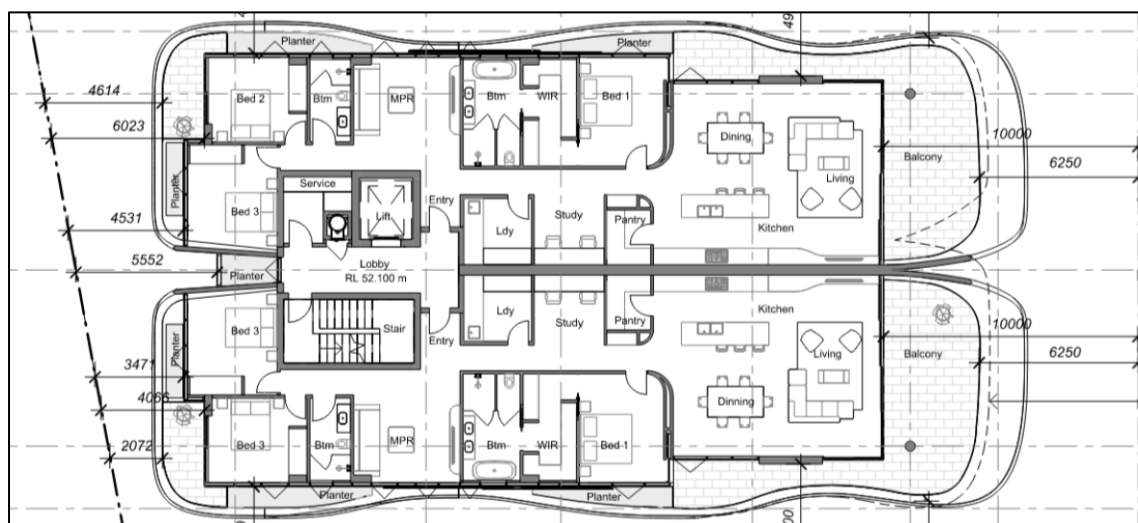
Level 04 Floor Plan. (Source: Contreras Earl Architecture)
